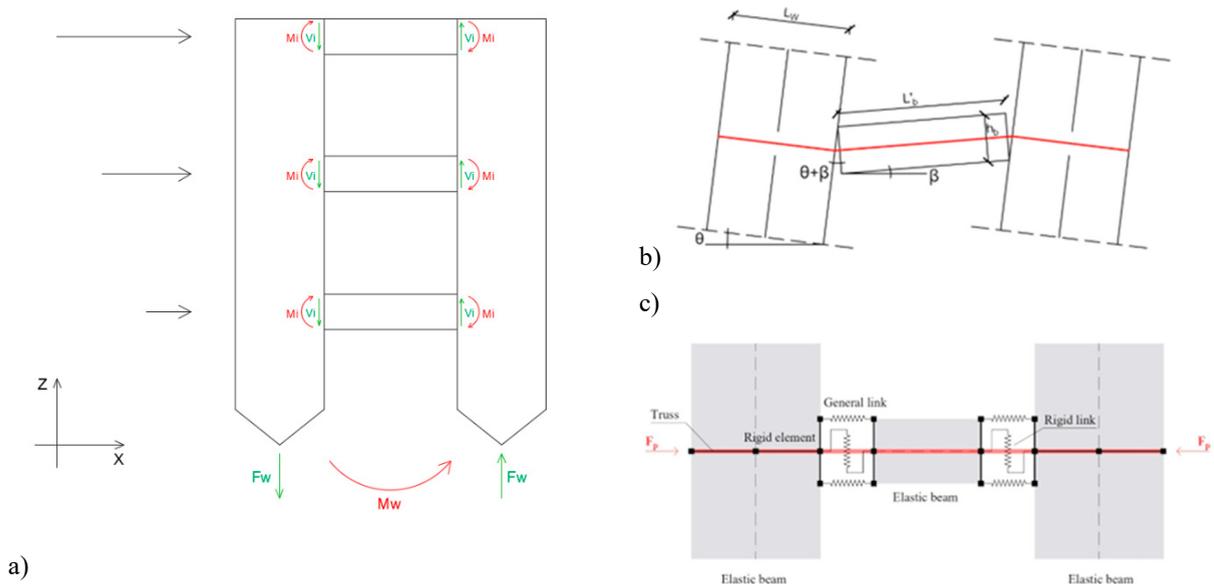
(a) double pin-supported walls internal actions; (b) beam to pin-wall interaction; (c) finite element modelling scheme.
